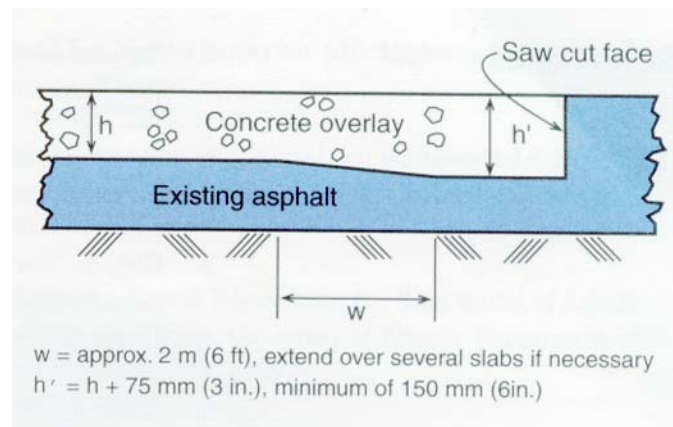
Suggested Transition Detail from UTW to Adjoining Paving Materials (Ref. 3).
